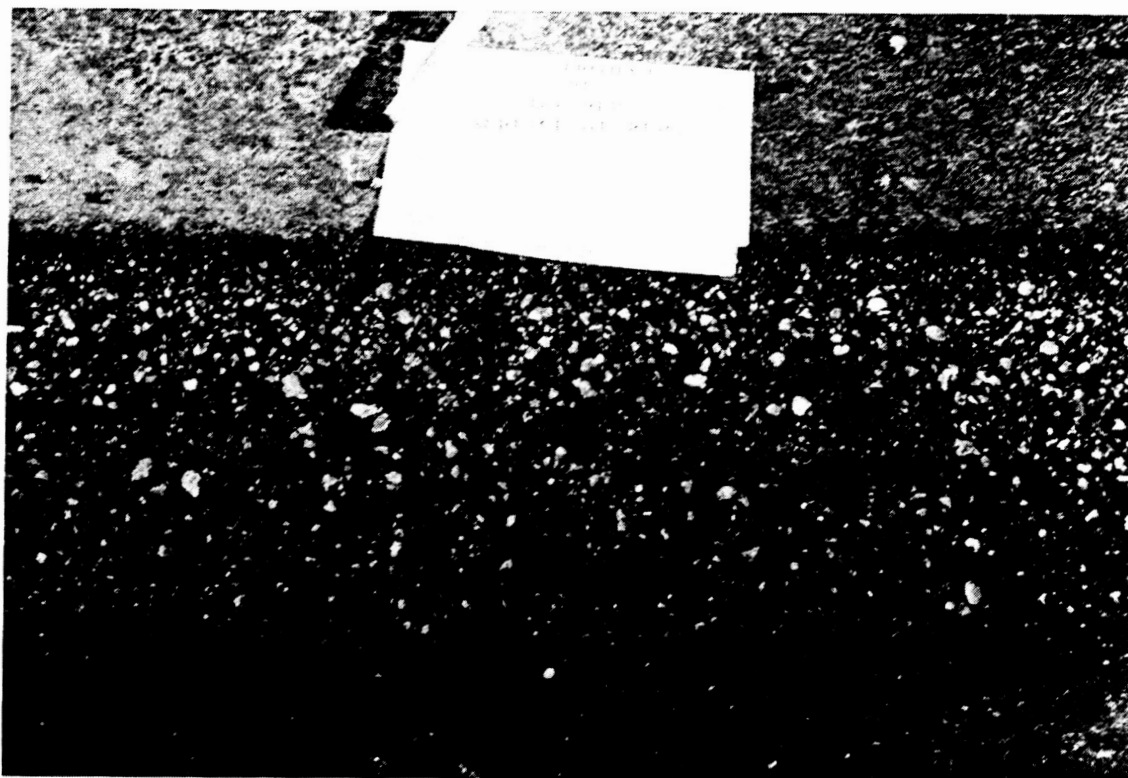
Rubberized section R1.5 @ 55,059 reps
